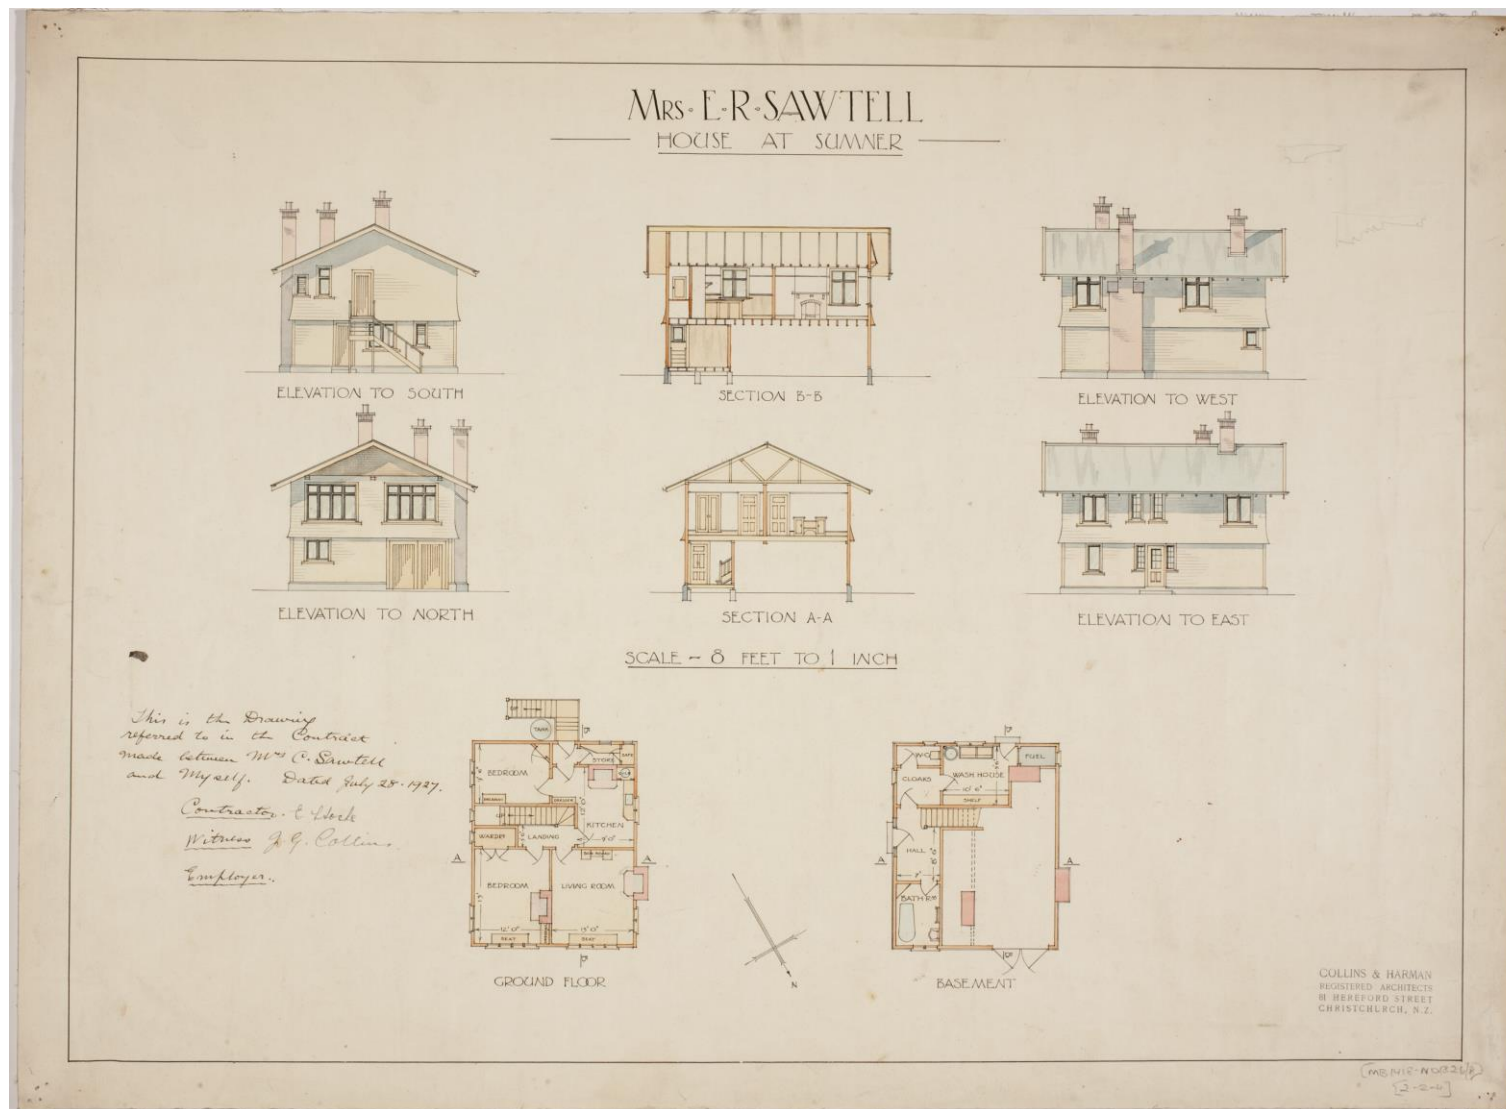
Collins and Harman, Mrs E. R. Sawtell, House at Sumner, plans, elevations and sections (1927).
